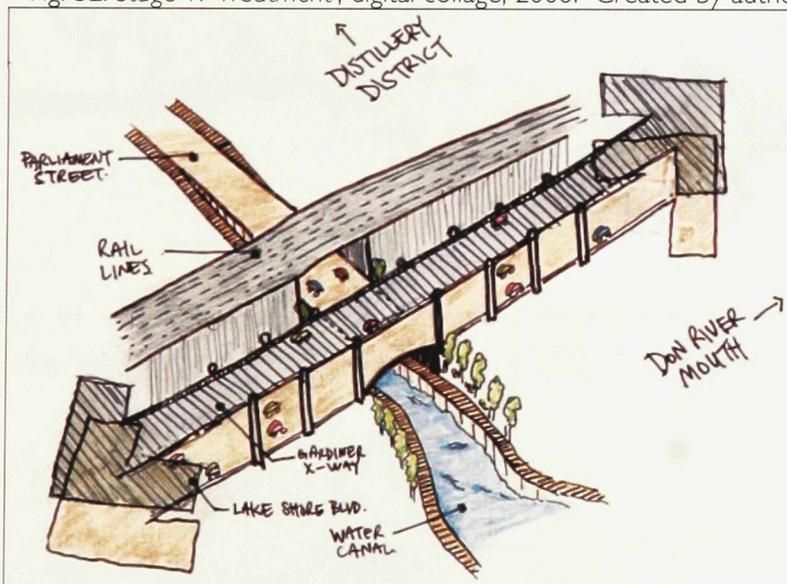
Parliament Street Connection Detail, colour pencil and pen, 2008. Created by author.
